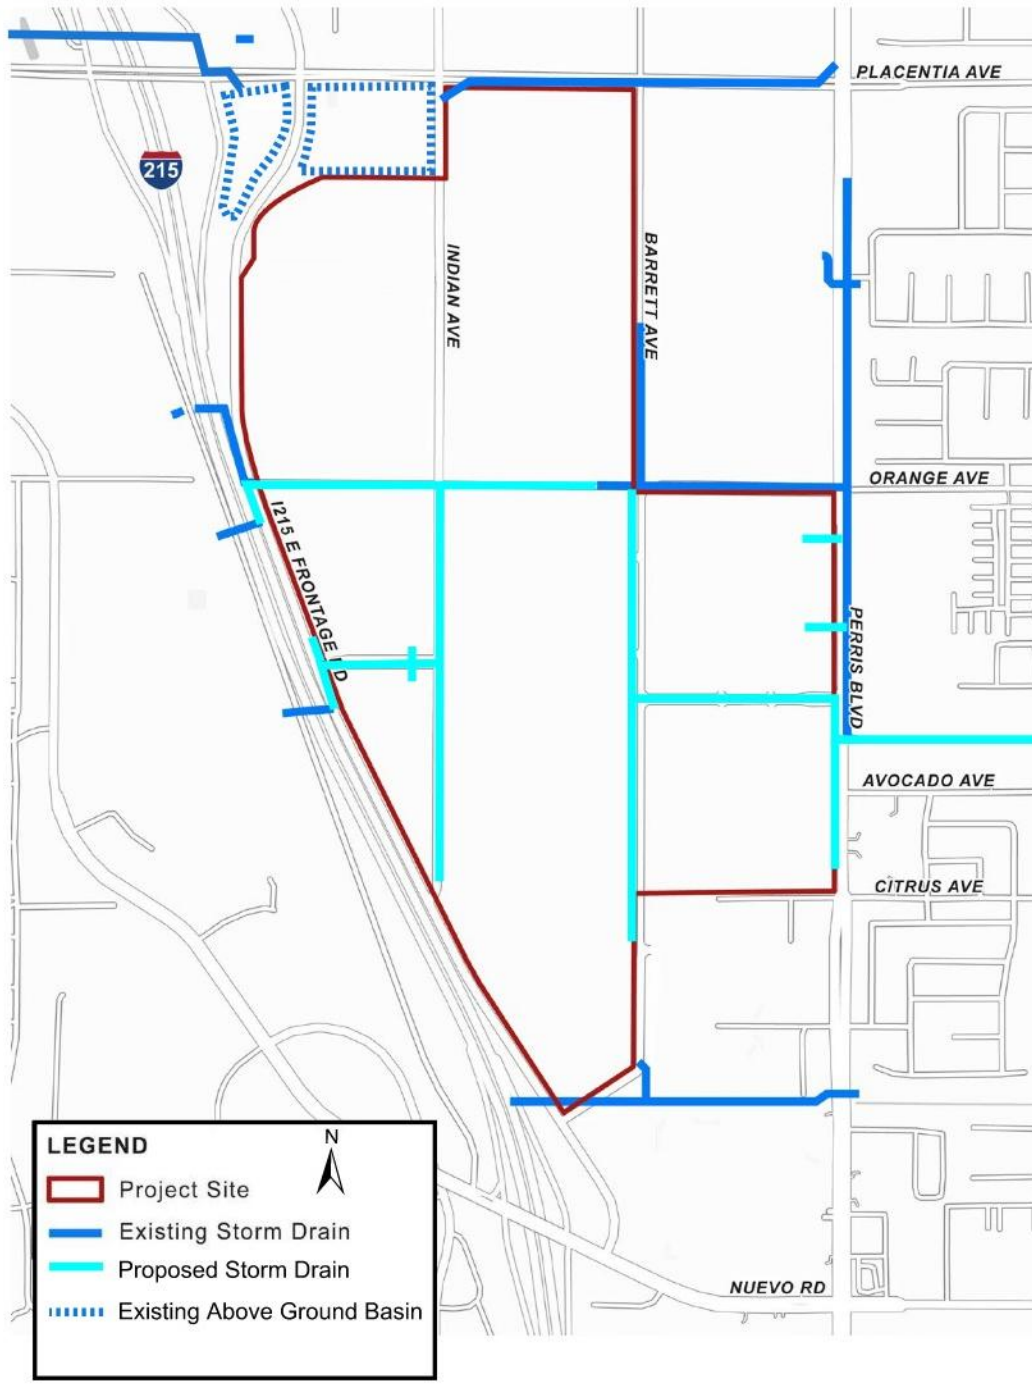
, Existing and Proposed Storm Drain Infrastructure
